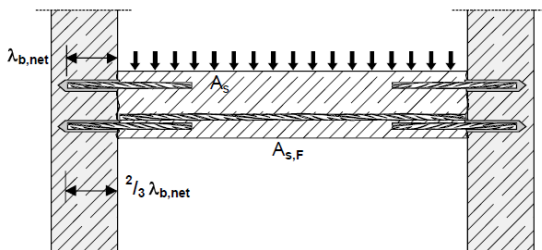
End anchoring of slabs or beams, designed as simply supported
